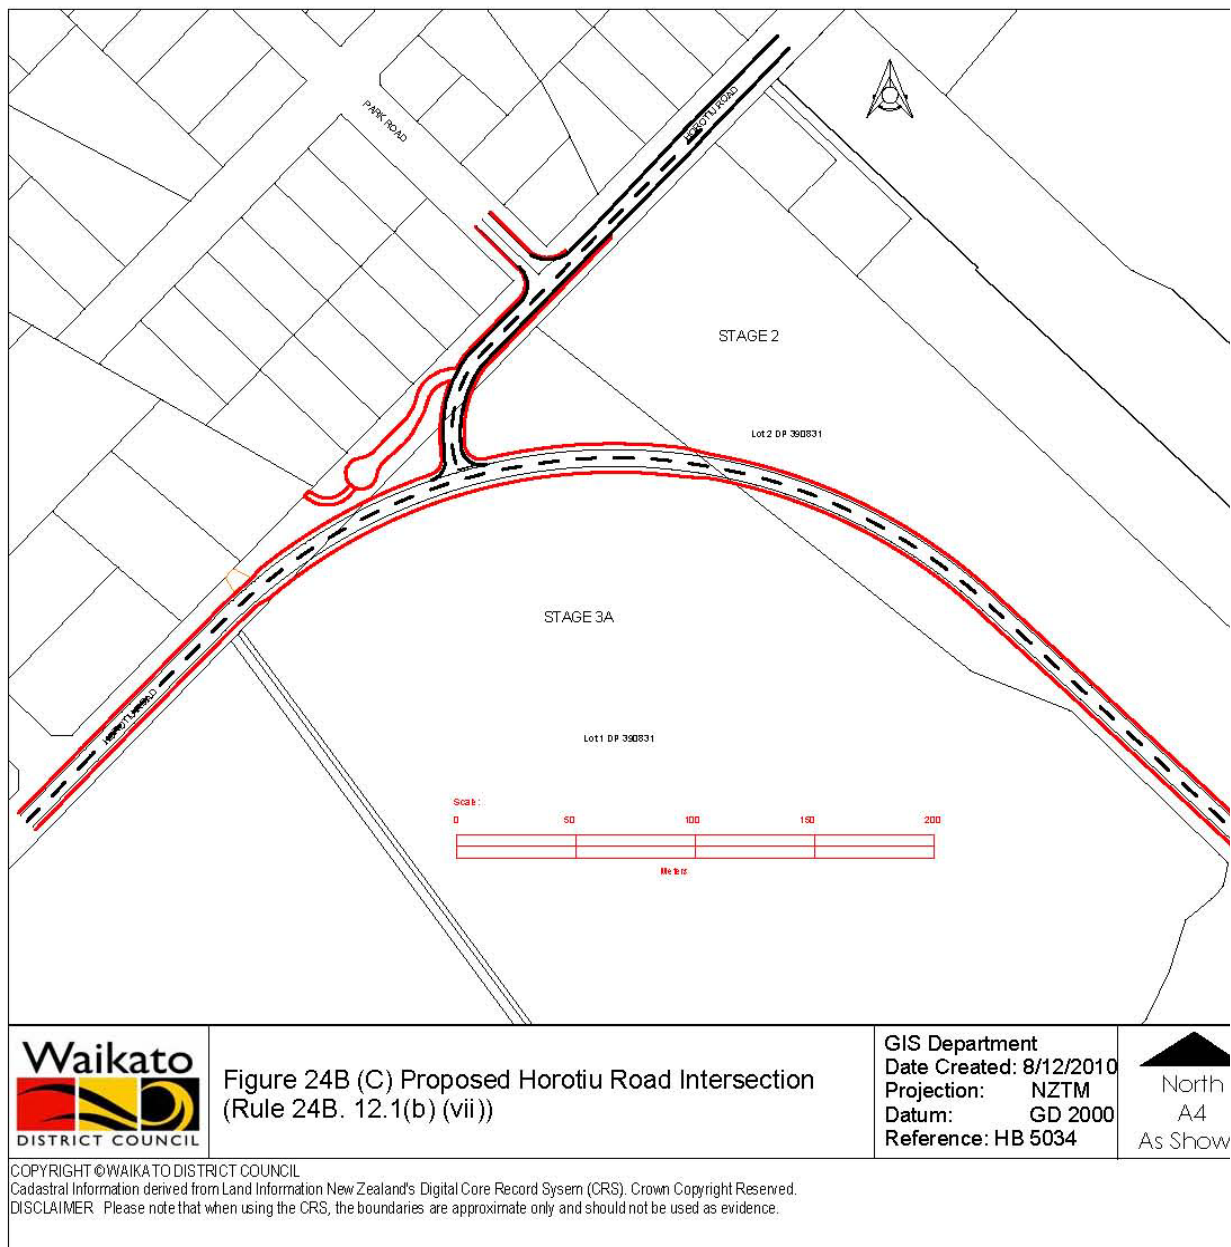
B (C) – Proposed Horotiu Road Intersection (Rule 24B 12.1(b) (vii))
